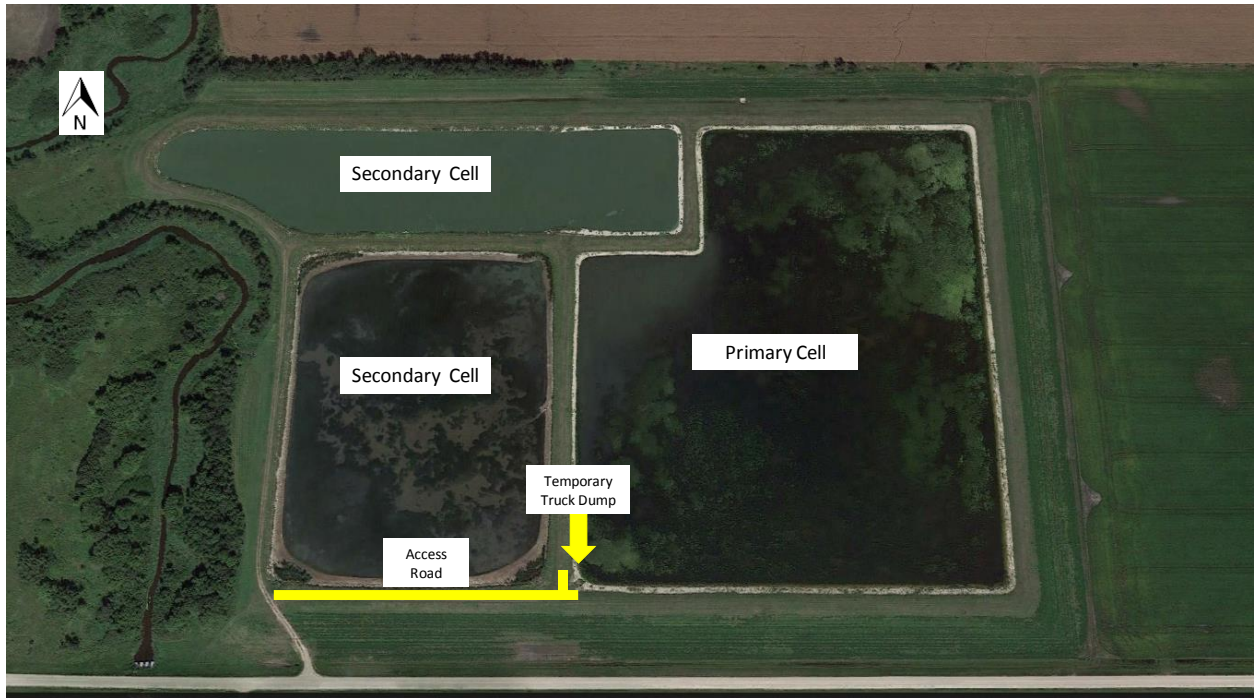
Proposed site for temporary access road and truck dump for St. Adolphe wastewater lagoon.
